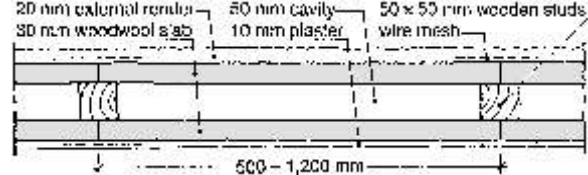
Wall with a wooden loadbearing structure against which woodwool slabs are nailed on both sides. (Using 30 mm thick woodwool slabs gives a U-value of 0.9 W/m²K).
